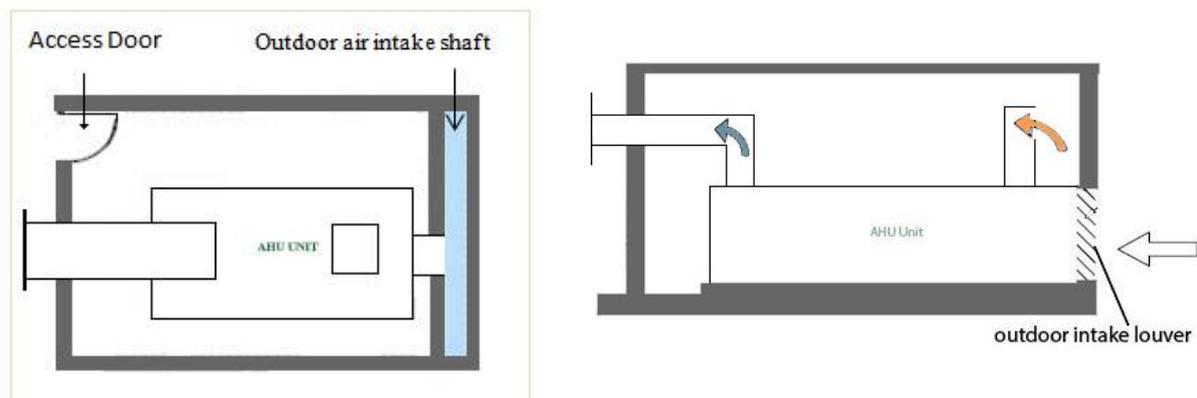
Typical plan & section of the mechanical room for AHU with shaft or louver. (Source: Author,2020)
